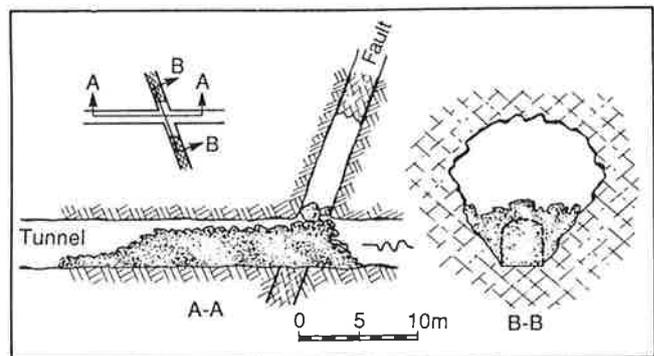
Sketch of the collapse blocking the  $12\text{m}^2$  headrace tunnel at Hemsil Power Plant (1960). It was caused by a 2.5m-thick, brecciated zone with thin veins containing swelling material.
